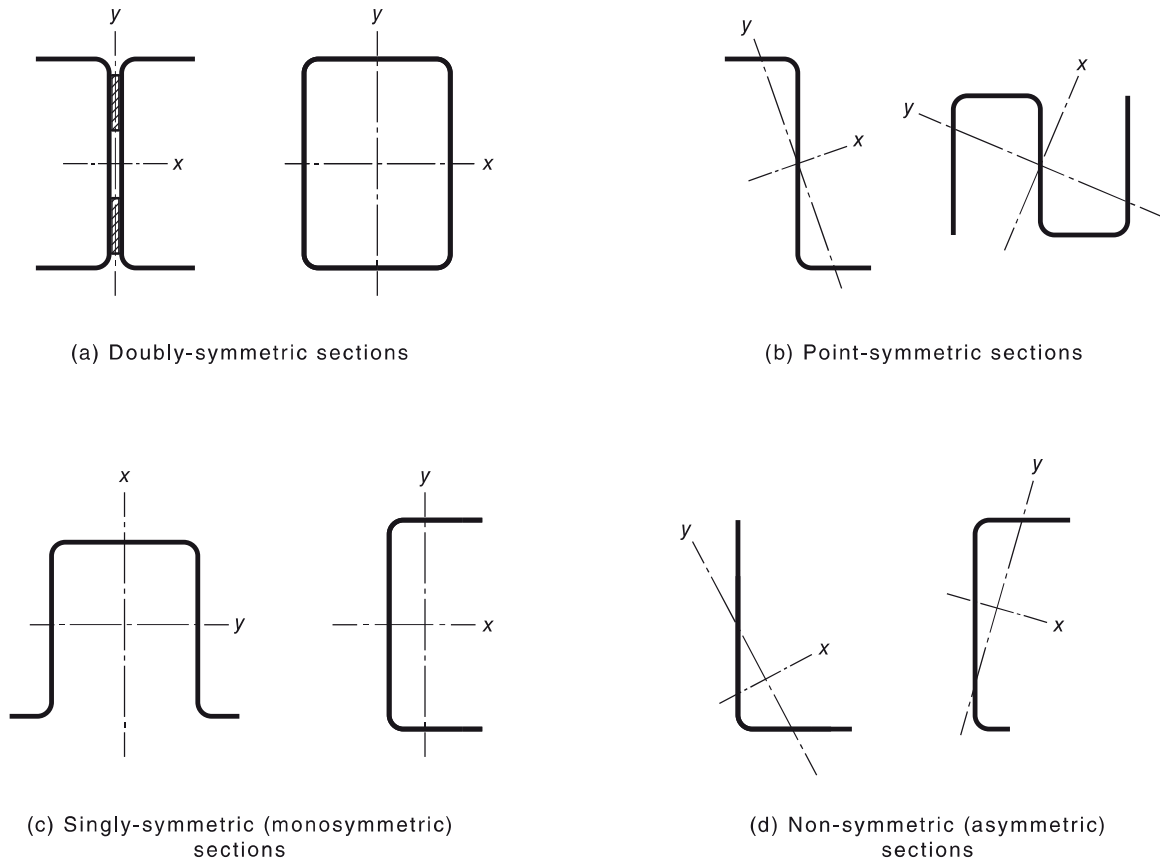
(E) EXAMPLES OF SECTION SYMMETRY
